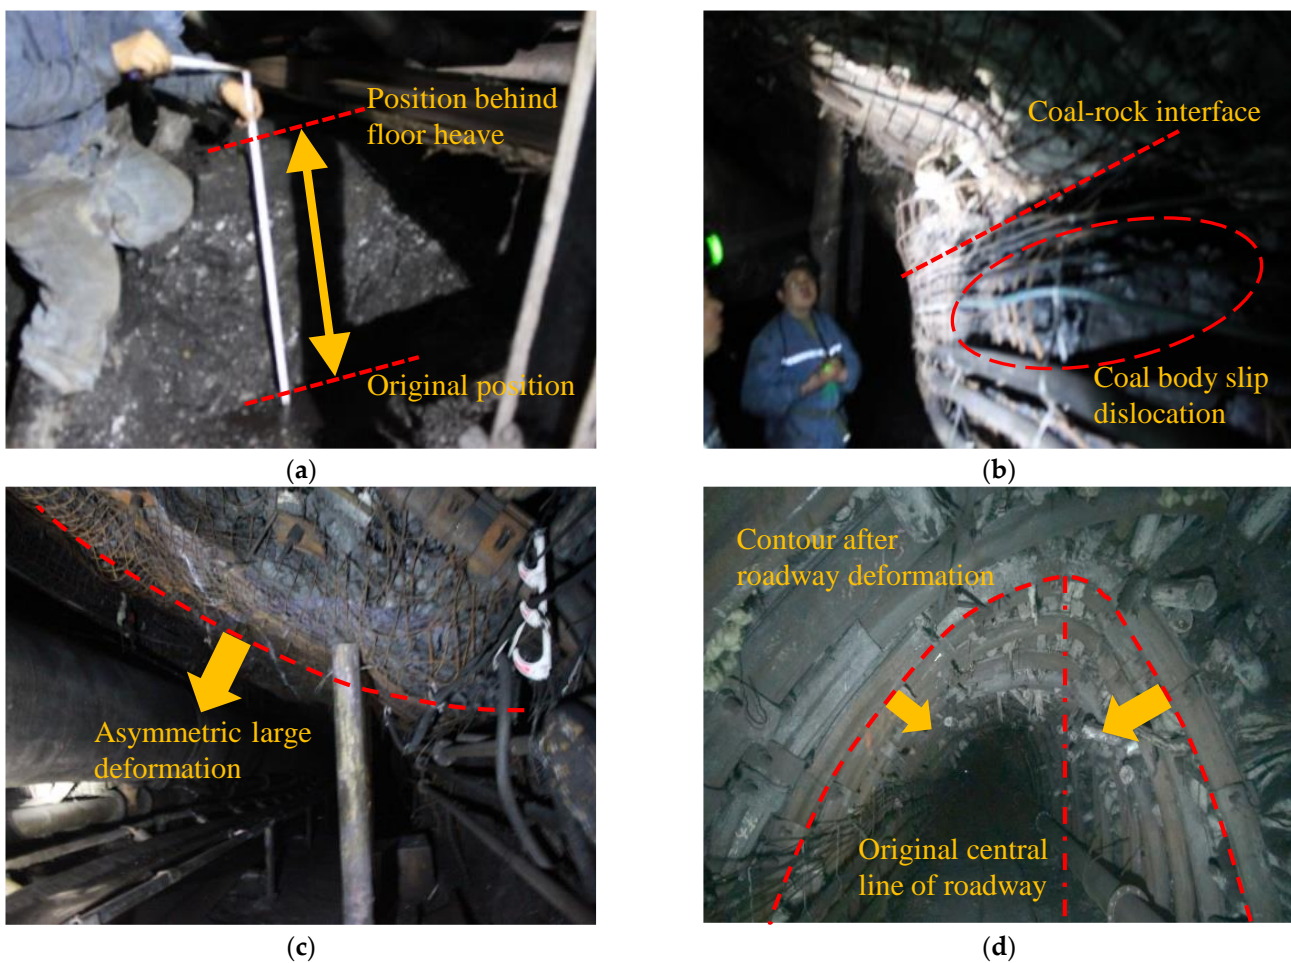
Pictures of roadway deformation characteristics. (a) Continuous floor heave; (b) coal–rock interface slip dislocation; (c) asymmetrical failure of bolt–mesh–anchor support; (d) asymmetrical failure of U-shaped steel support.
